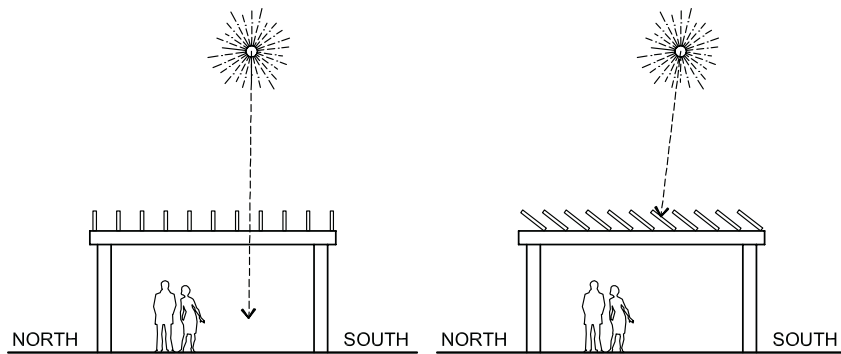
The typical pergola has shading elements that are on edge like joists. Such a design will provide little shade at 12 noon. Instead, the louvers should be tilted toward the north.
